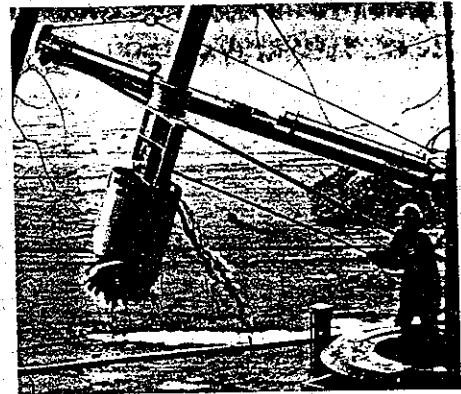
As drilling proceeds, material is excavated by a cylindrical bucket fitted with auger-type cutting blades on the bottom. When the bucket is full, it is raised above the drive table and swung off to the side by the dumping arm.
